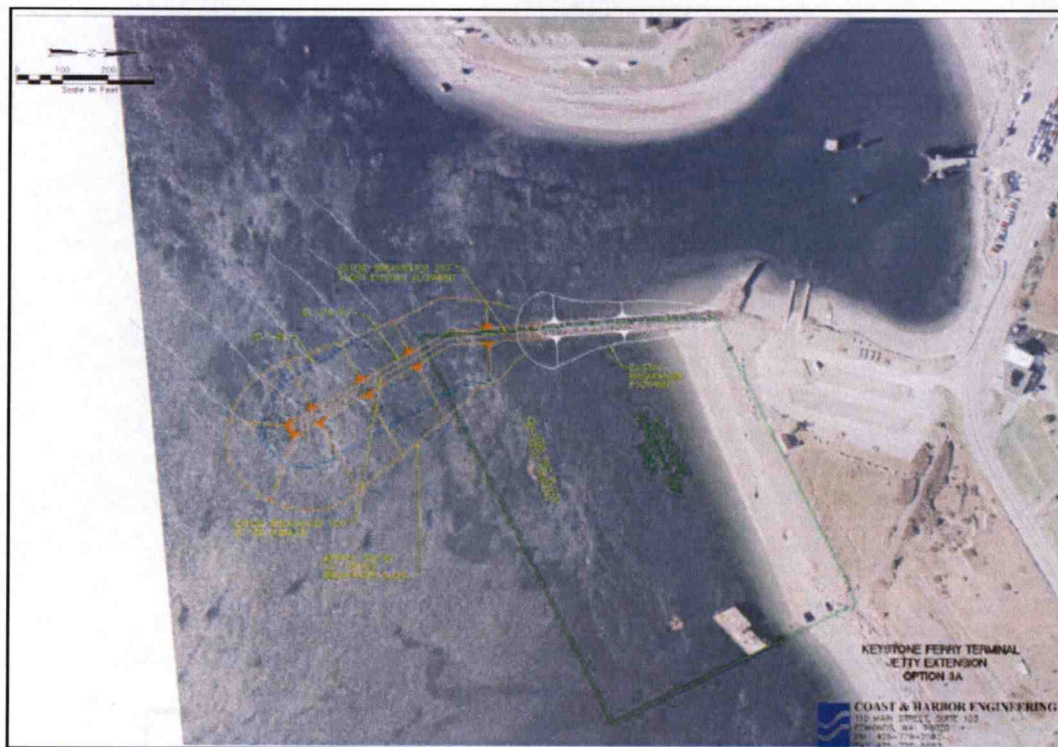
Design overlay of proposed jetty Alternative 3A. Courtesy of CHE.
